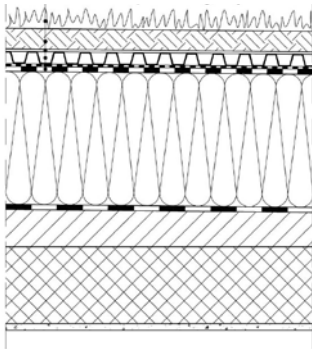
Typical green roof structure. Layers from top: vegetation; substrate; filter layer; drainage layer; root barrier; waterproofing layer.
